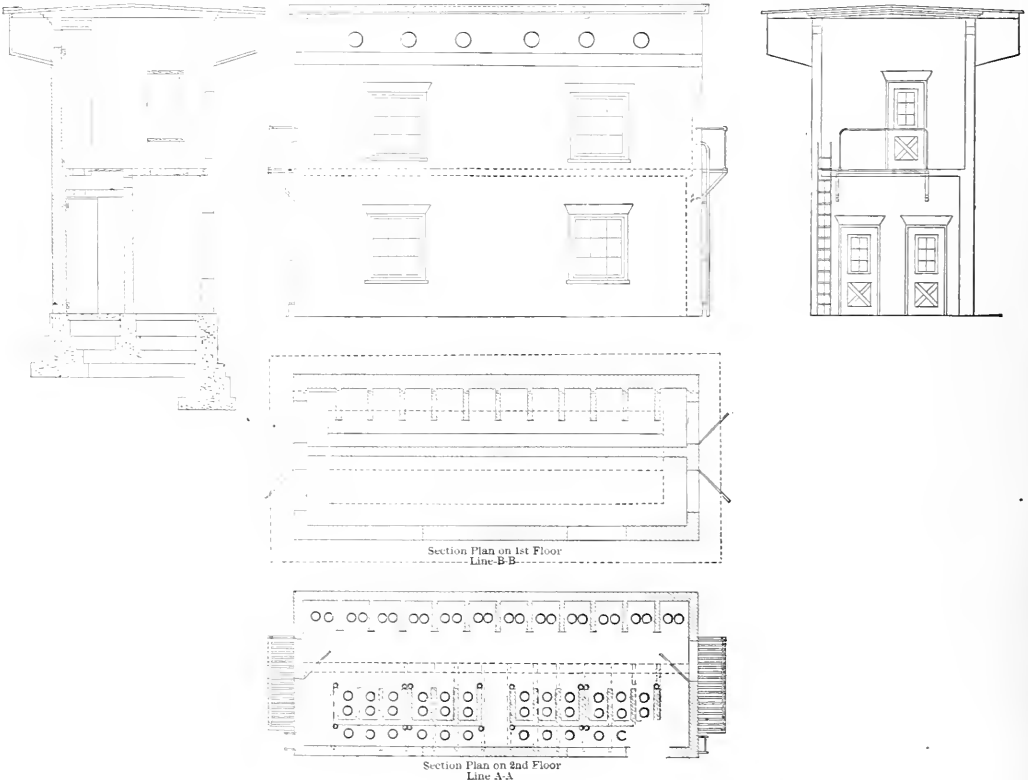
ELEVATIONS AND PLANS OF TERMINAL HOUSE AT SCHENECTADY.
